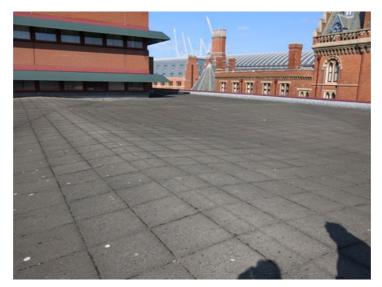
The lower flat roof, Level 4, looking north-east toward St Pancras Station – shows the levels and falls to the rainwater outlets.
